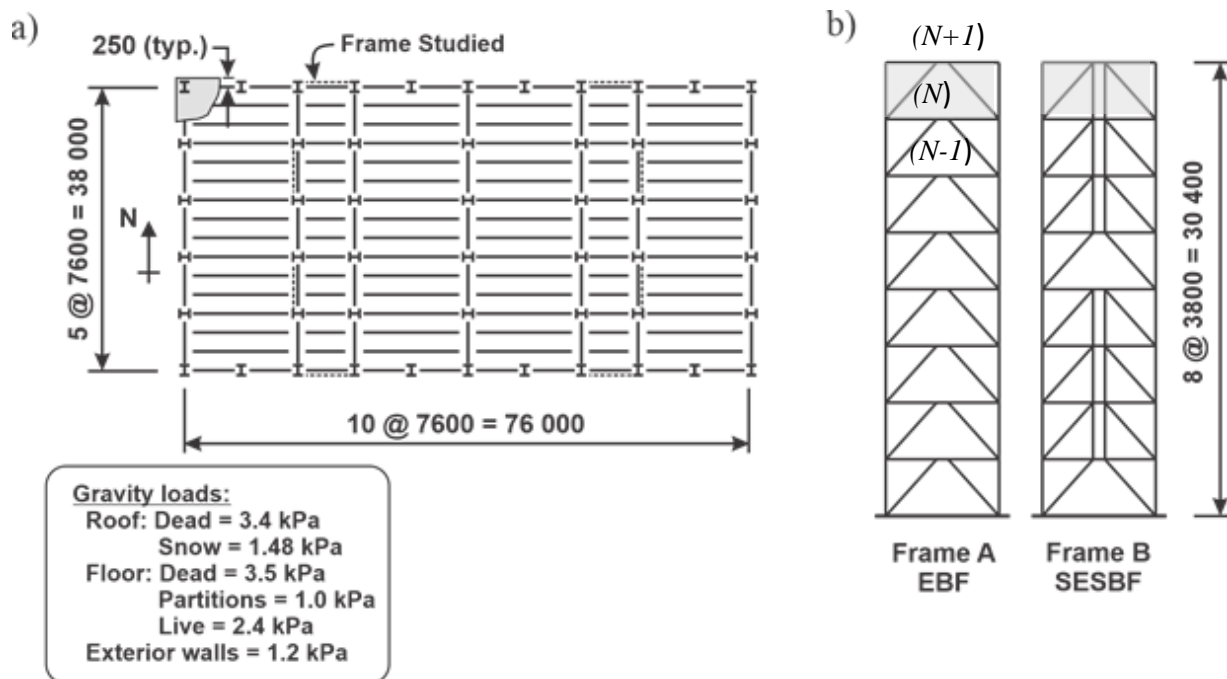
Building studied: a) Floor plan, b) Elevation of 8-storey framing systems, c) Loads
